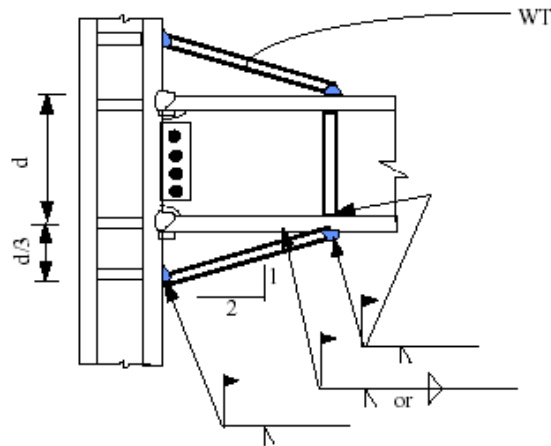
Welded top and bottom haunch connections.
